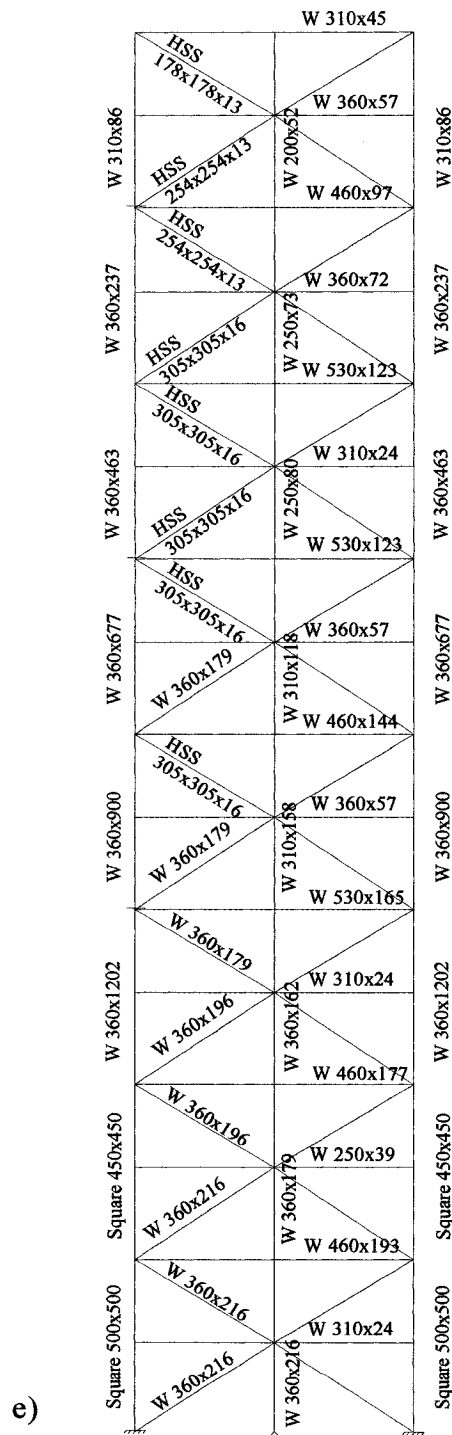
(cont'd) Brace, beam and column sections for the studied buildings:
